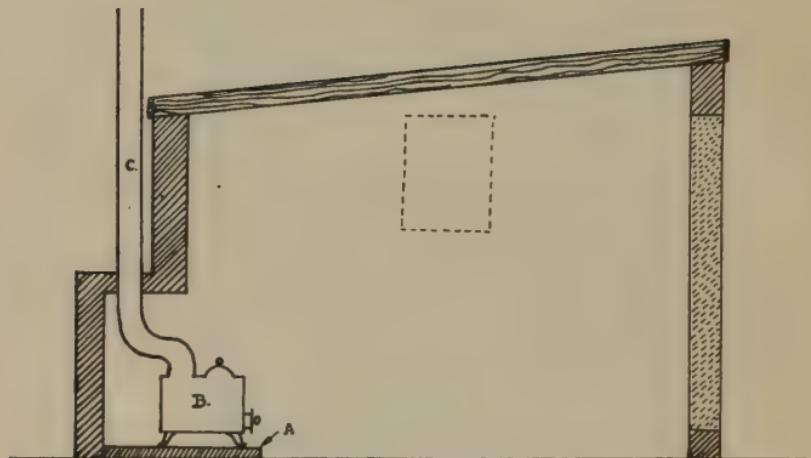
Section of officers' house (Fig. 143). (*Designed by Geo. B. Lake, M. C.*)
